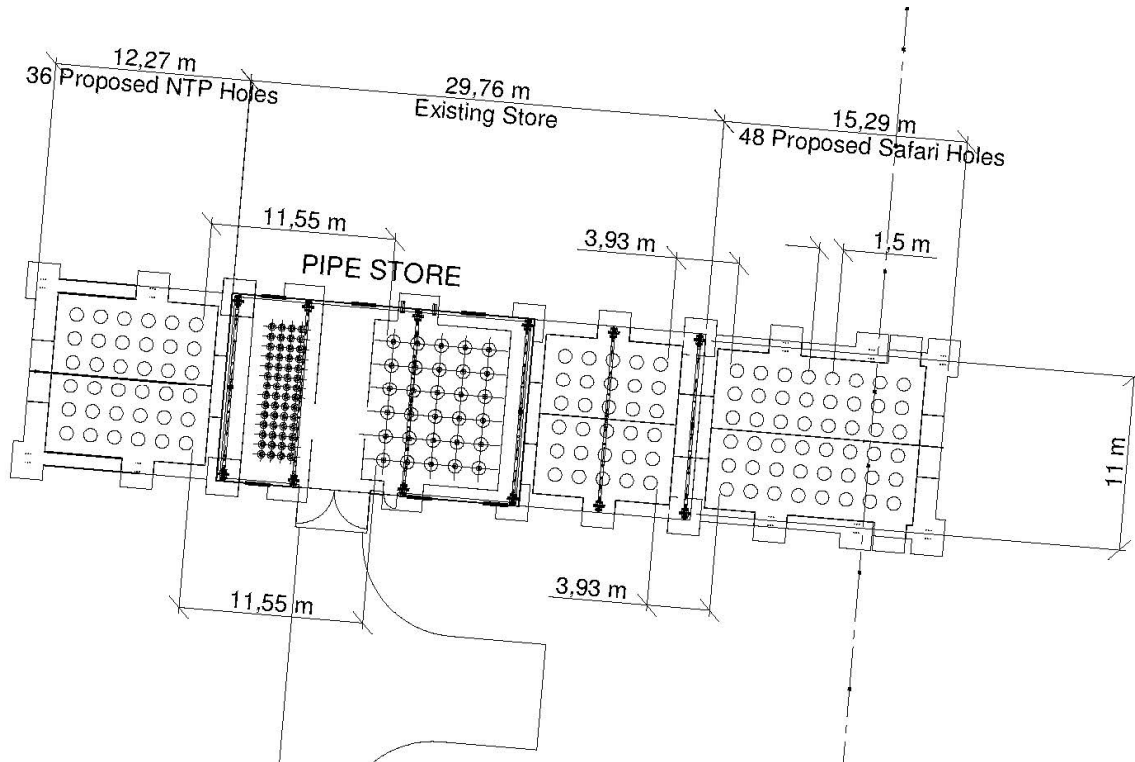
Plan layout of Existing Store Facility and Store Extensions on each side.
